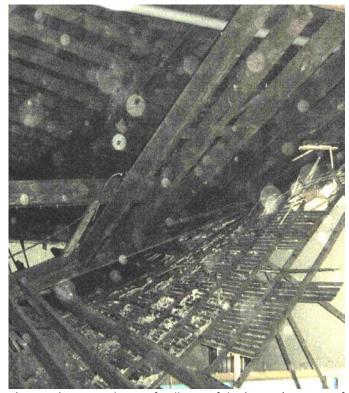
'Catastrophic Roof Collapse of the 'Dining' Wing Roof.
